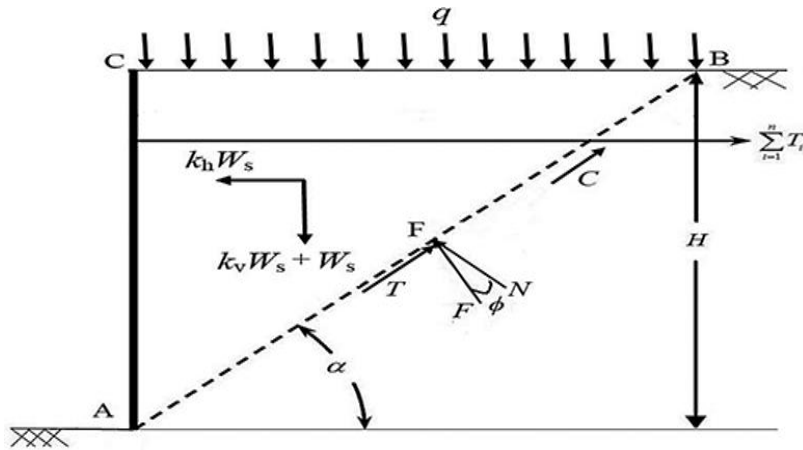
Forces acting on a reinforced soil wall with a c-φ soil fill.
